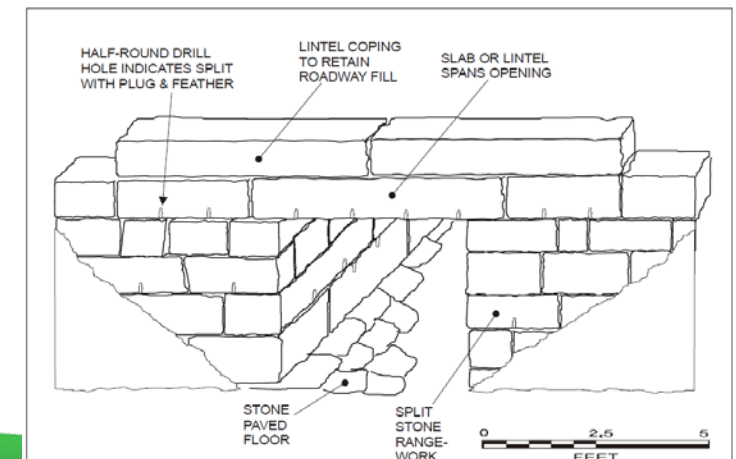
Typical 4-foot stone box culvert of split and cut granite quarry stone
